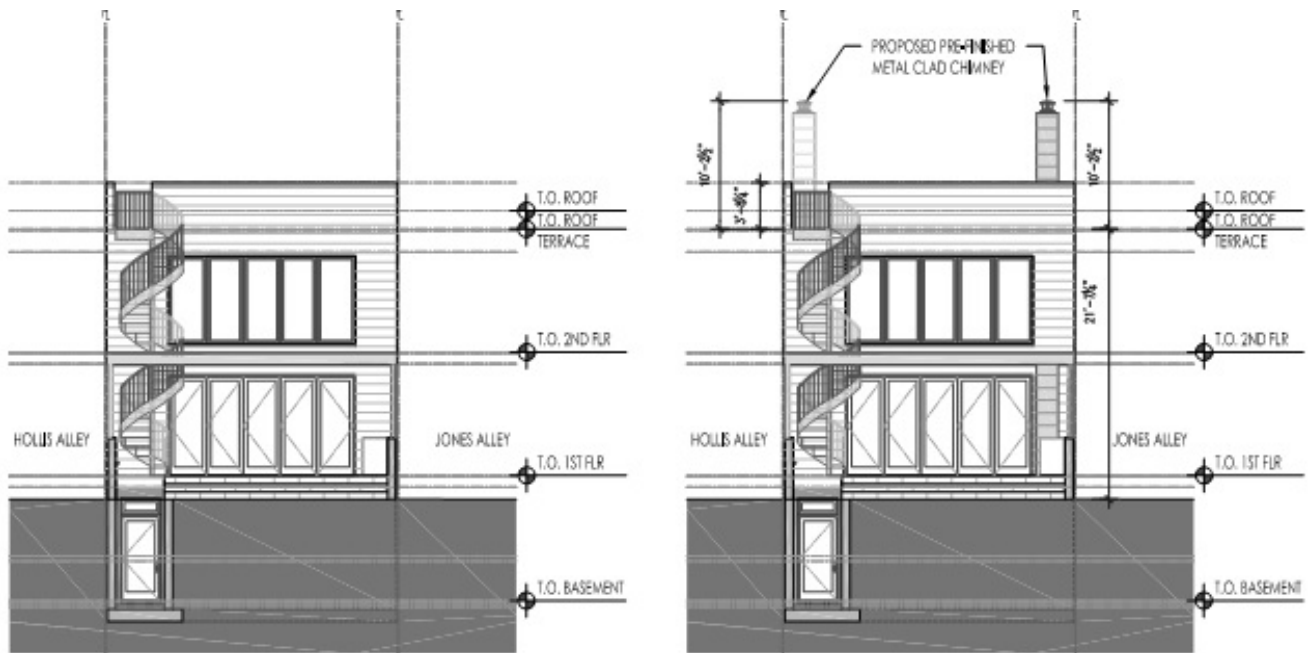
Left: Approved rear elevation. Right: Proposed rear elevation with chimneys
